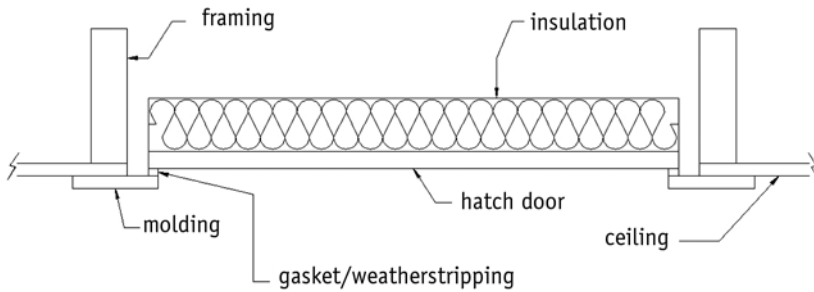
Attic hatches are commonly constructed simply by laying a piece of plywood on a frame formed by wood molding
